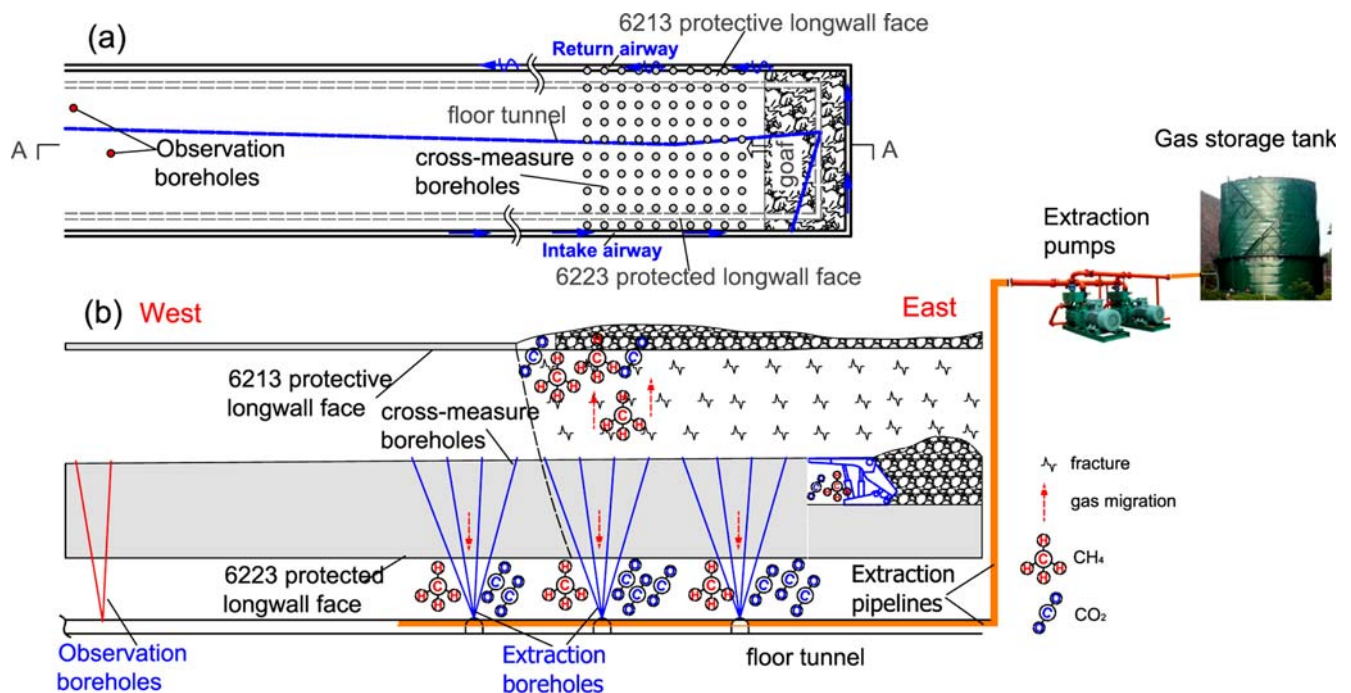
Diagram of the spatial configuration of the protective longwall, protected longwall and stress-relief gas drainage. (a) Horizontal plane view; (b) vertical section view.
